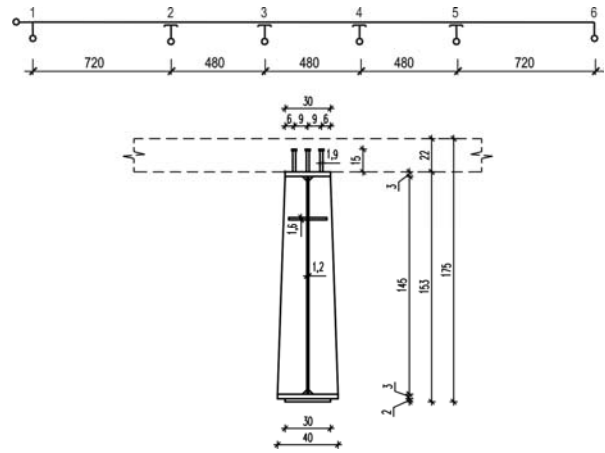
Static schema during construction stage and beam cross-section of the D(Mo)010 bridge
